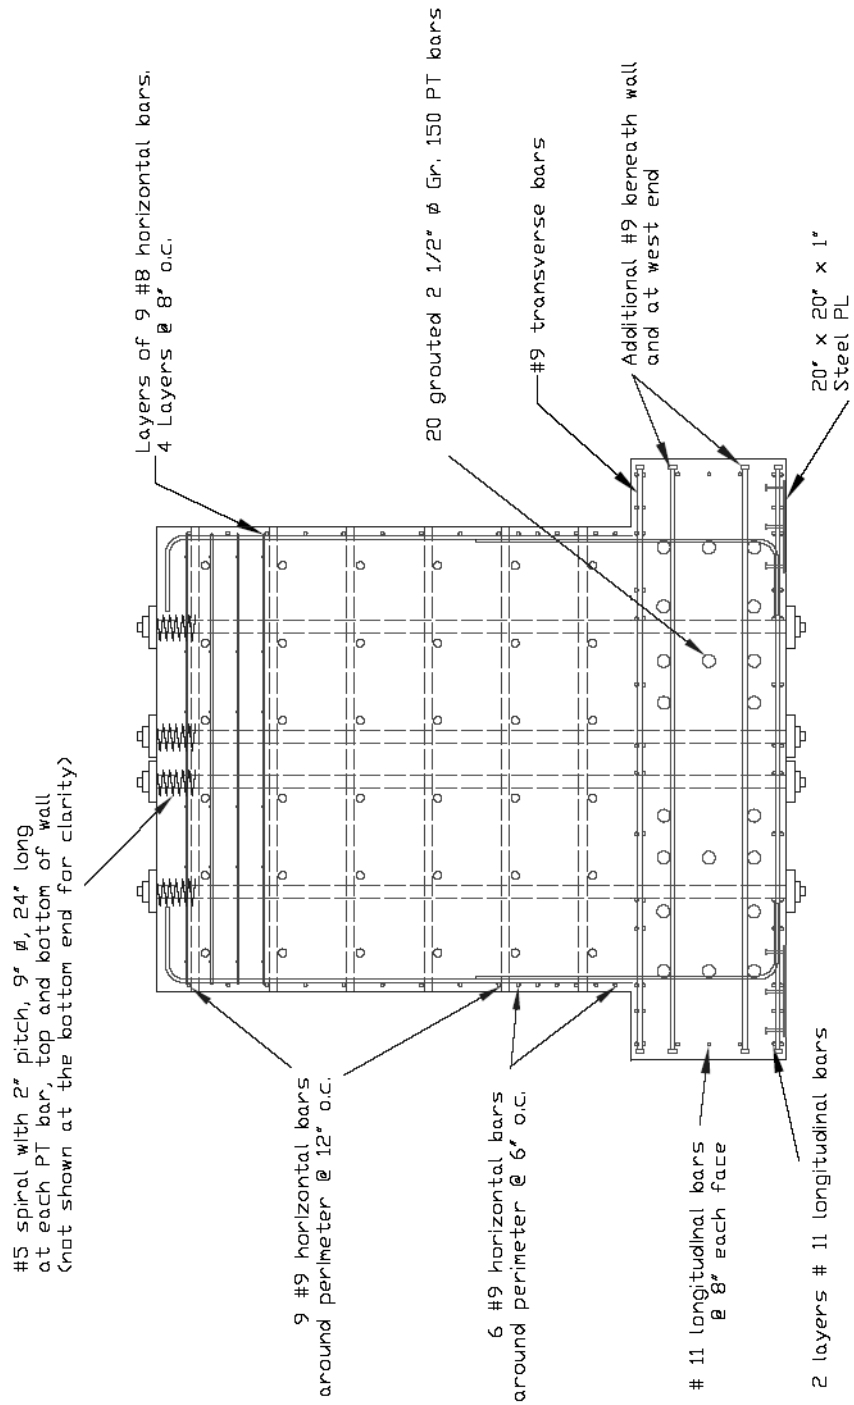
Isolated Slab Longitudinal Section at Fixed Wall
